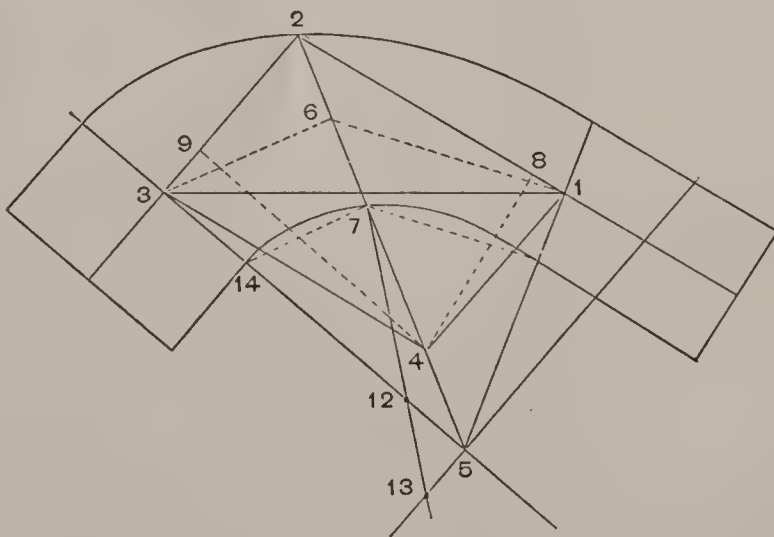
SHOWING MANNER OF DRAWING MOULD.
